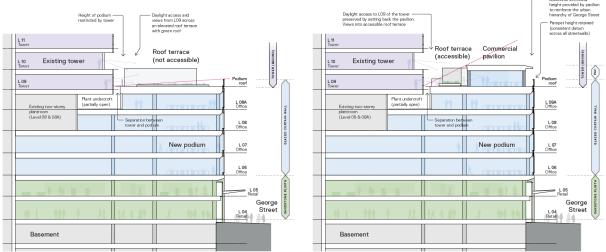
Diagrammatic section comparison of the George Street and Margaret Street podium design, original proposal on the left and amended proposal on the right
